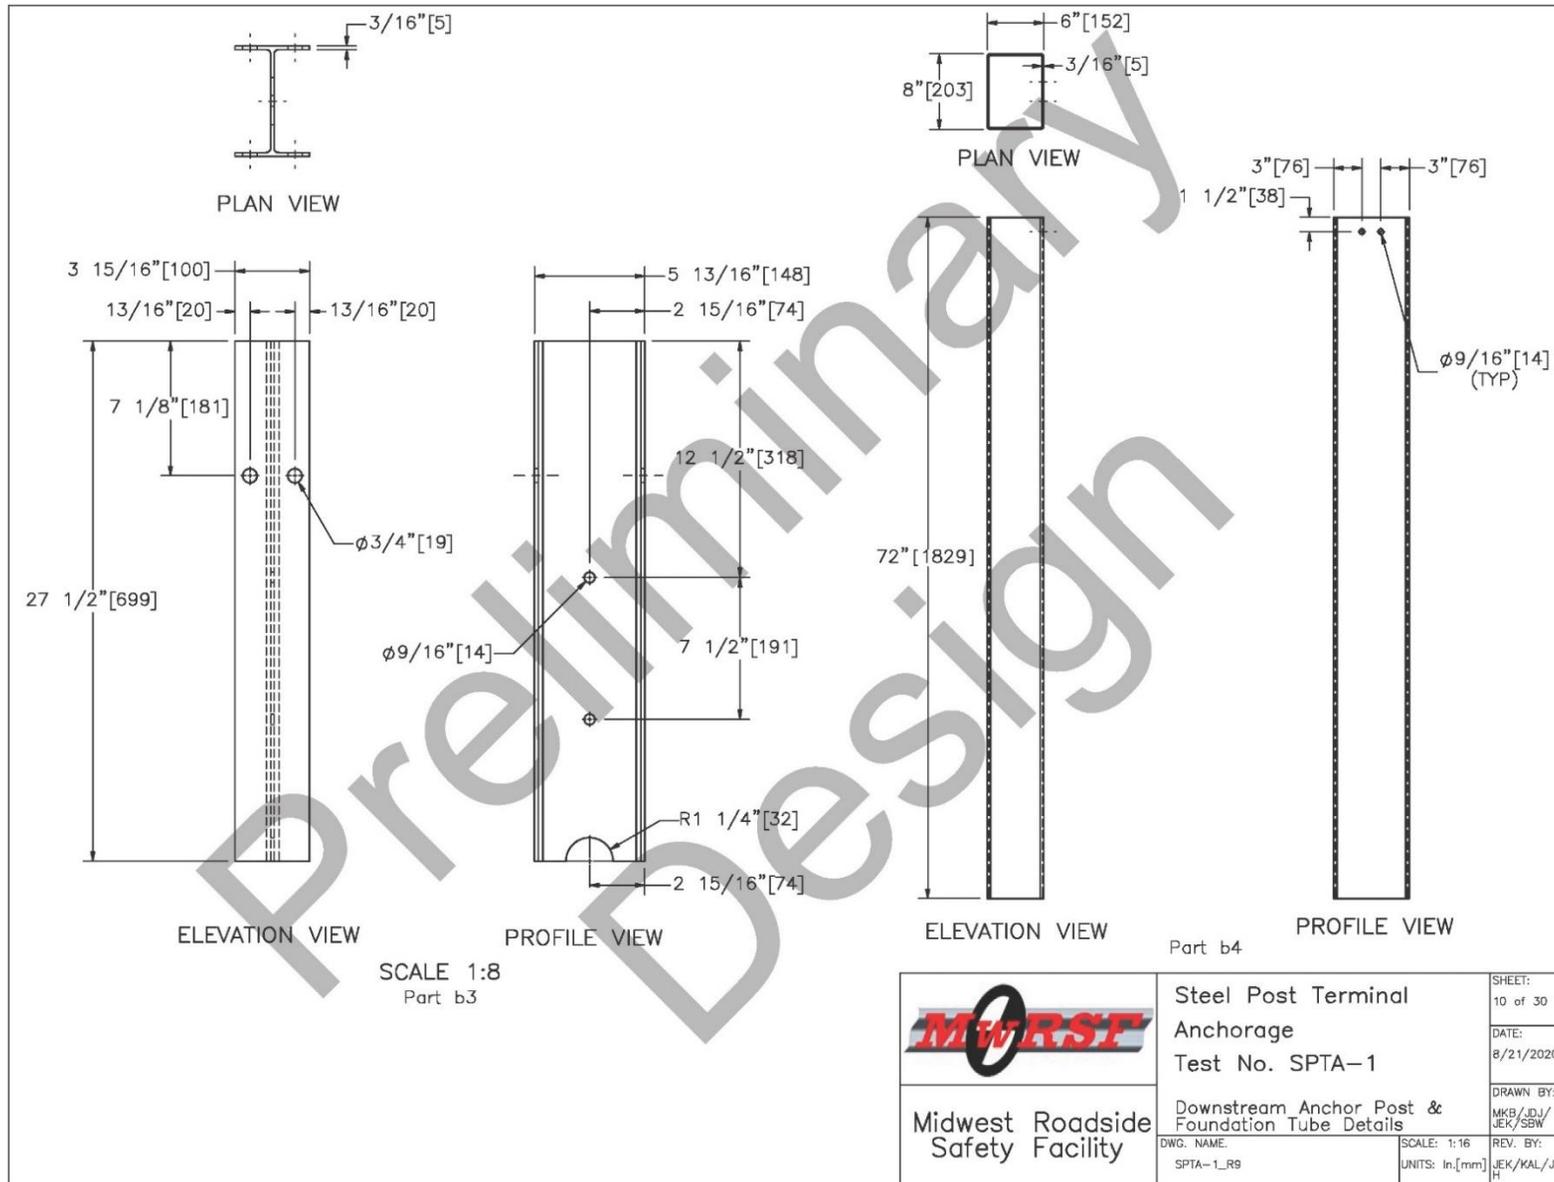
Downstream Anchor Post and Foundation Tube Details, Test No. SPTA-1
